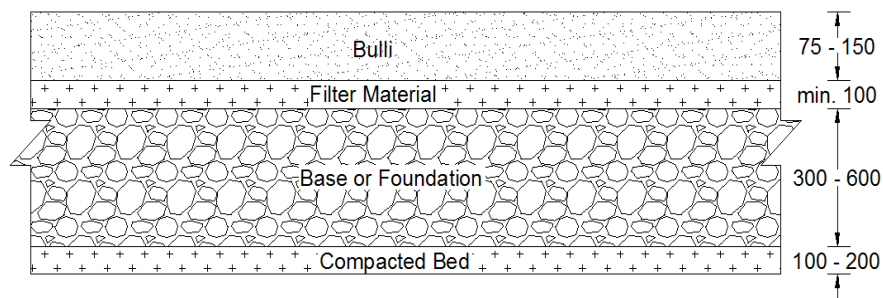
Cross section of slow drainage pitch, usually test match pitch (All dimensions are in mm, Taiton and Klug, 2002)
